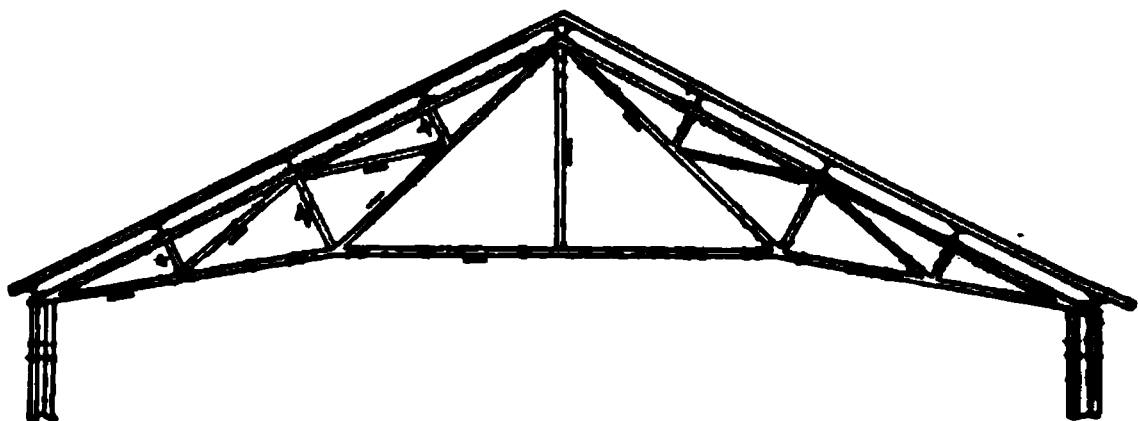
French Truss. Spans from Forty to Eighty Feet
